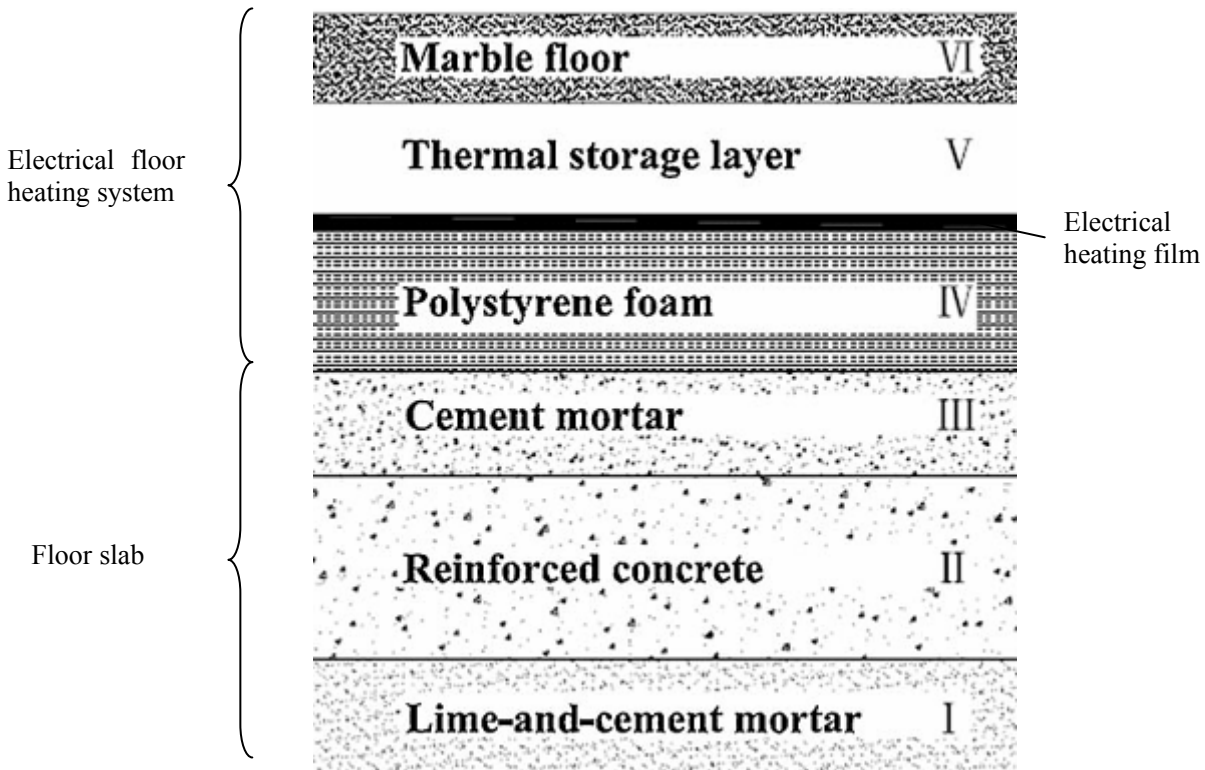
The configurations of electrical floor heating system and floor slab in reference [74].
